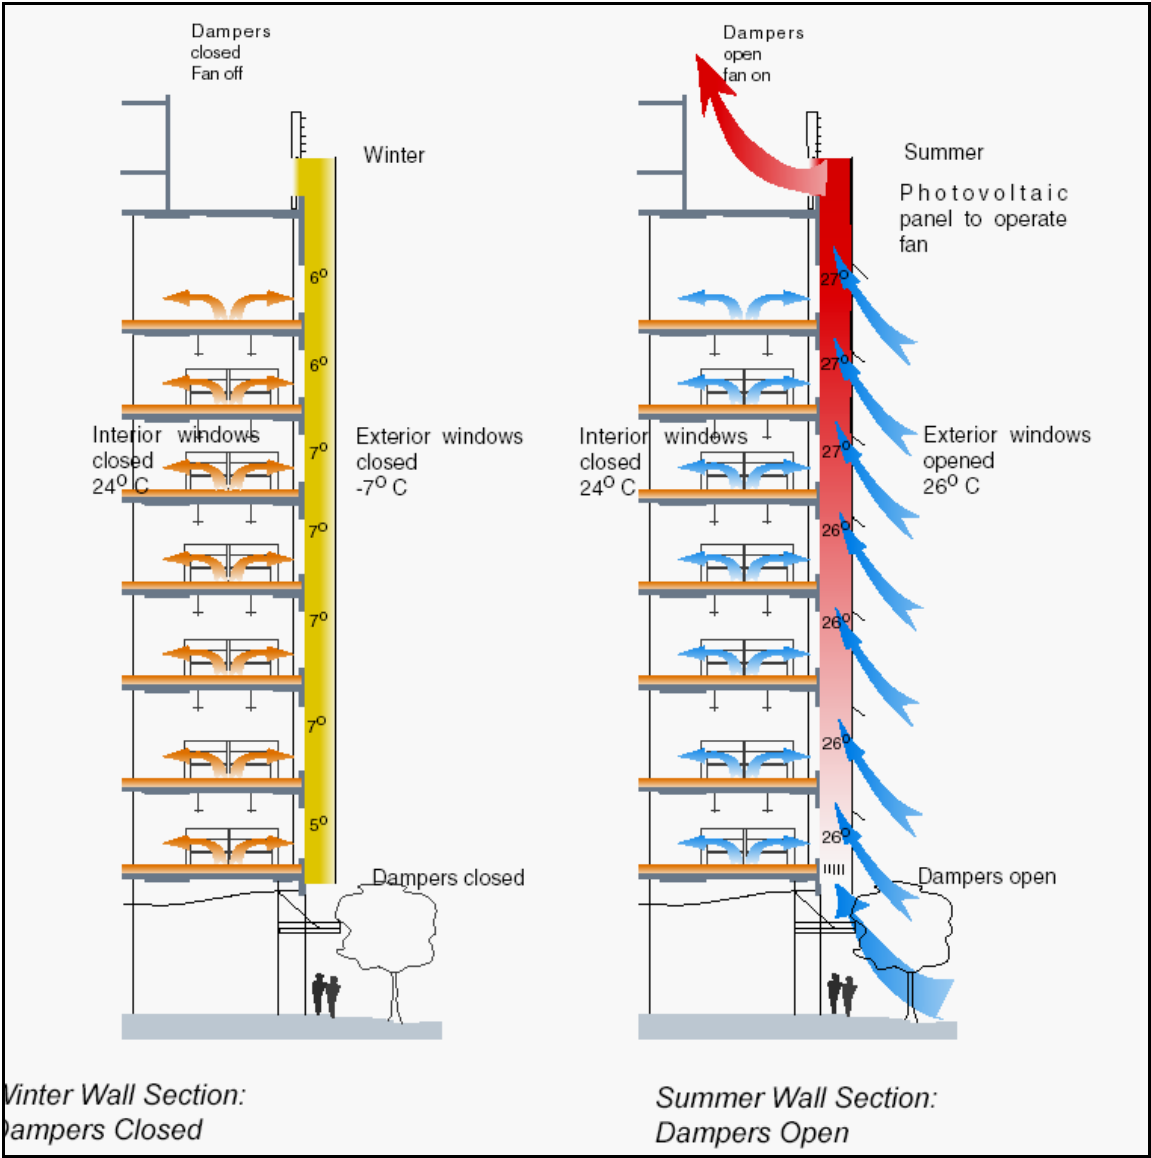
Wall Section through the Facade of the Telus Farrel Building [5]
